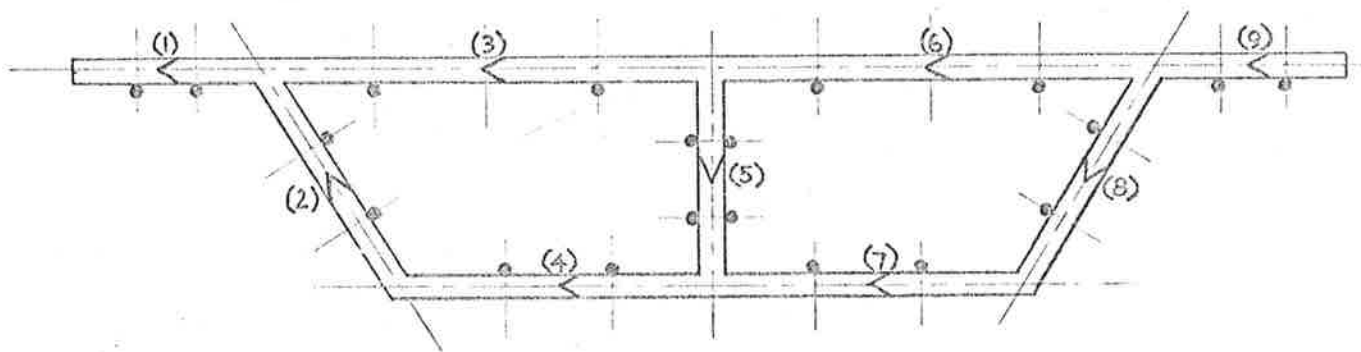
Instrumented 25° cross section of diaphragm structure
